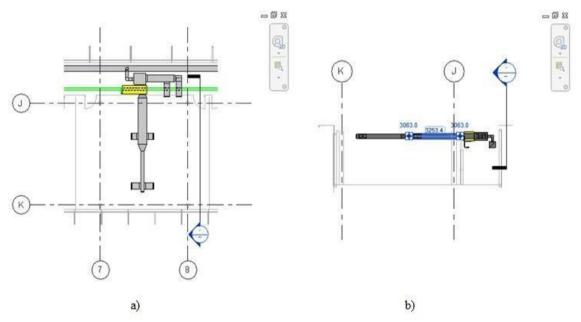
The floor plan of a room with a water source heat pump (a) and a cross-sectional plan (b).
